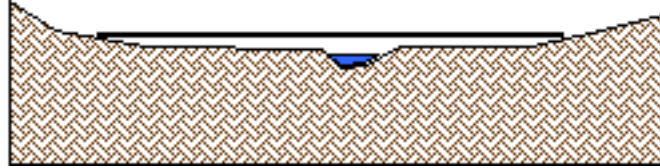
Center setback areas over the floodway with matching elevations at either boundary.
